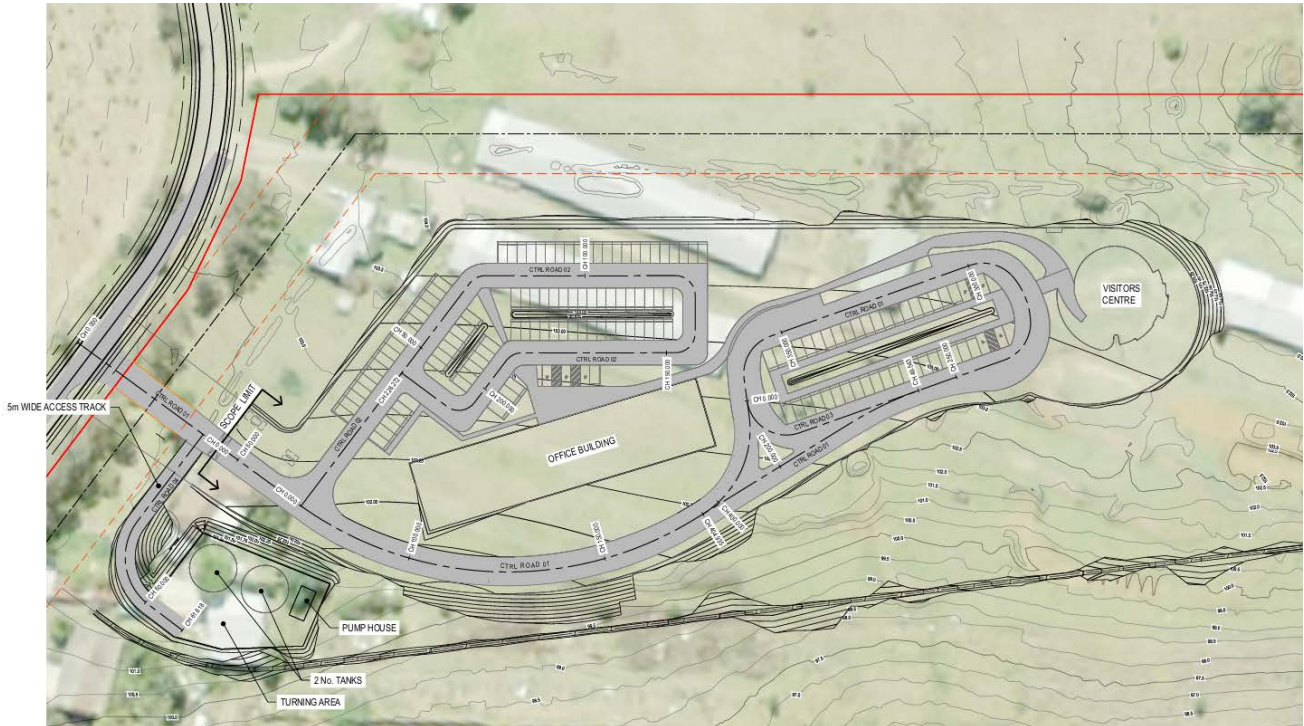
Preliminary Visitor Centre and Site Accommodation Site Plan
